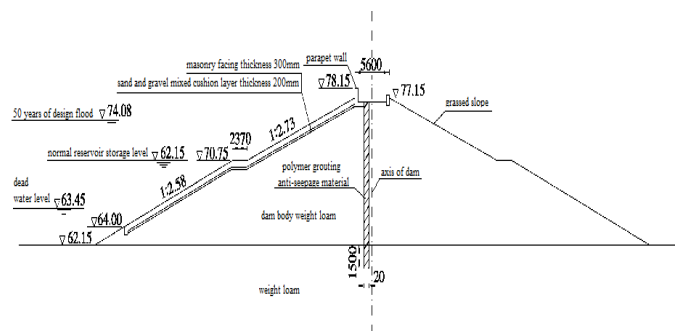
Sketch of polymer diaphragm wall for an earth-rock dam
